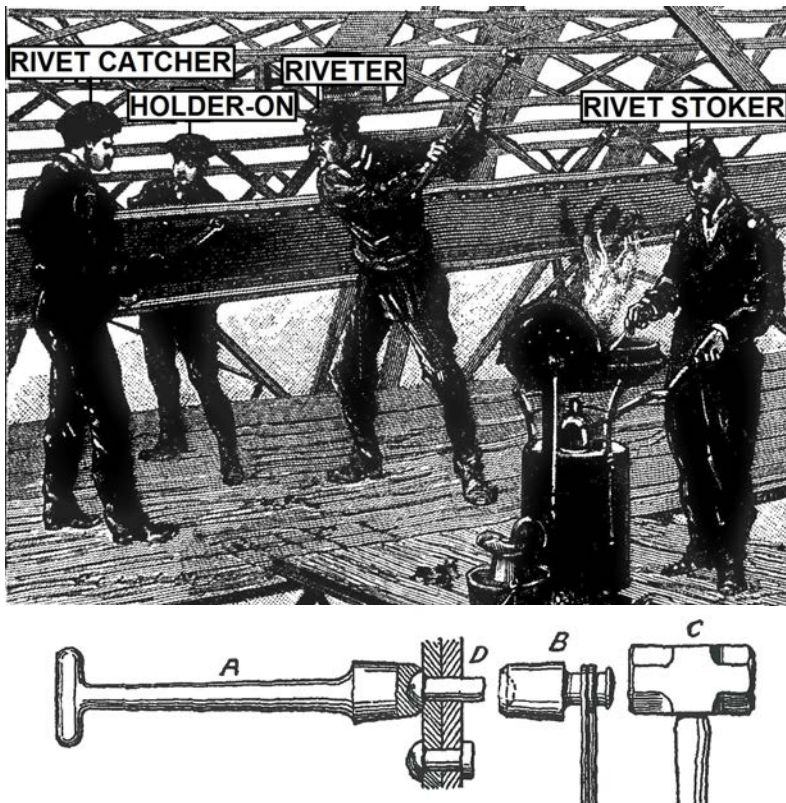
(Top) Members of a riveting gang and (bottom) riveting set of hand riveting: (A) the holder-up, (B) the rivet snap (+ tongs), (C) the hand-held riveting hammer, and (D) the rivet being driven (Tissandier 1889; Lineham 1902, 285)
